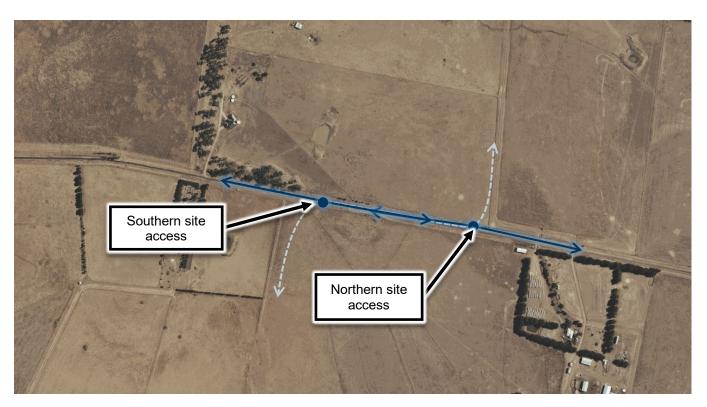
Sight distance at Woorndoo-Darlington Road crossing accesses
